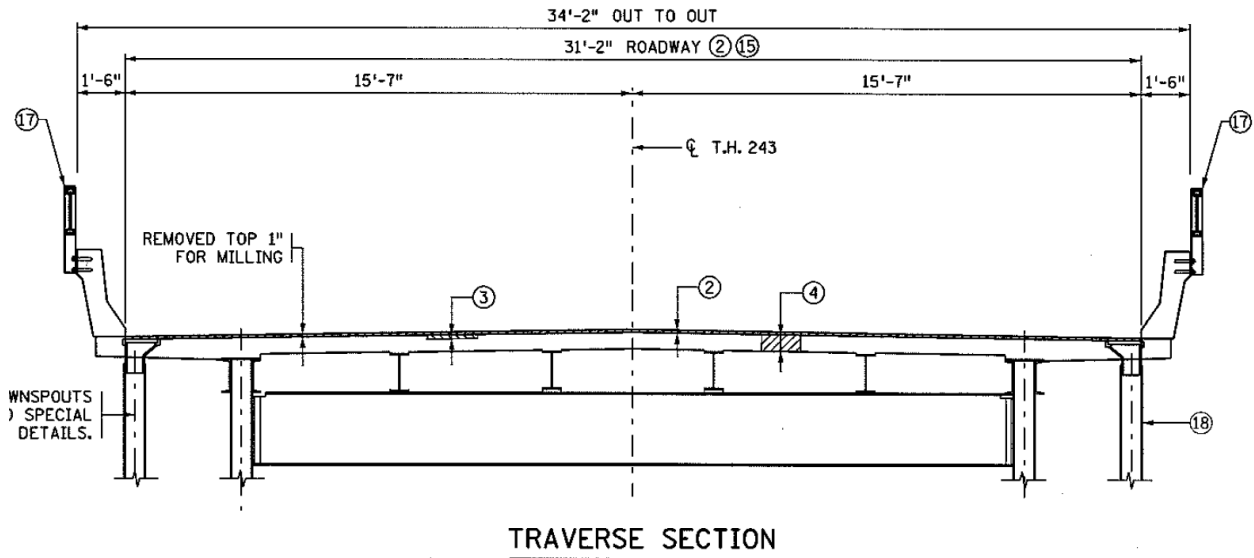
1980 deck cross section with 2 1/2" reinforcement cover to top bars.
